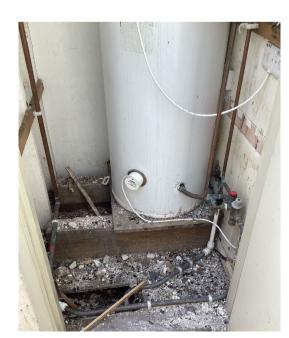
Photo 13 -Yew Tree Cottage, Immersion heater likely water damaged
